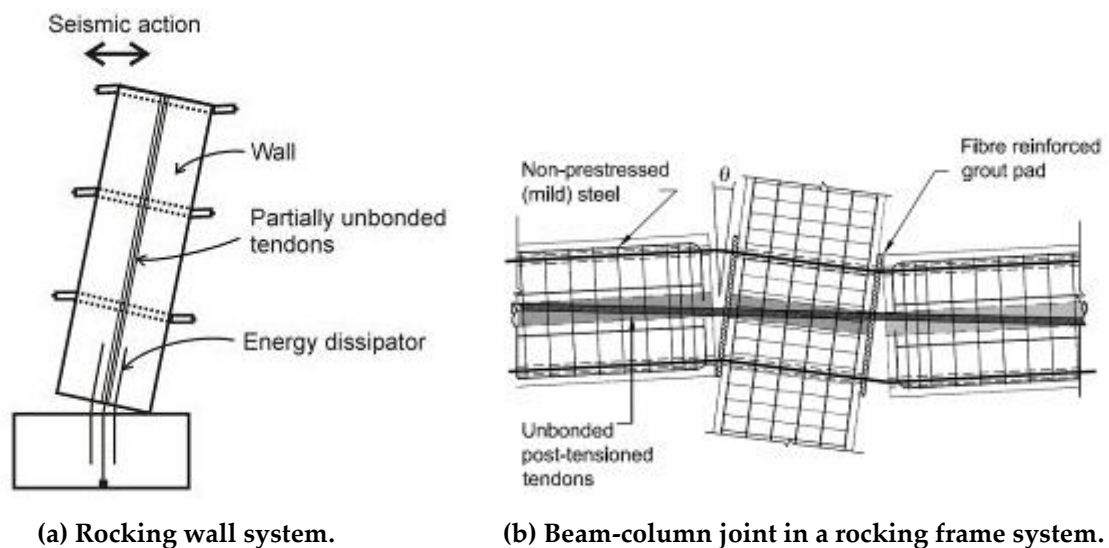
Rocking hybrid frame or wall system (after fib, 2003).
